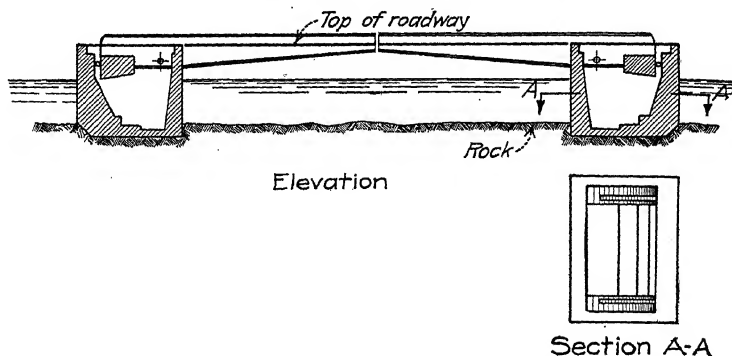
General design of Phoenix Bridge, built over the New York State Barge Canal; also 35th Street Bridge, Chicago, built 1914.
